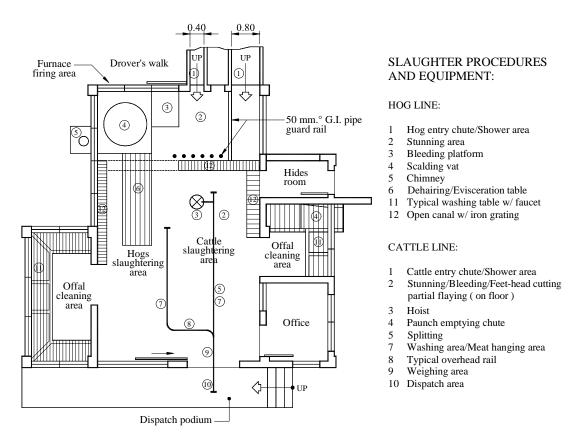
Typical floor plan and procedures for a class A slaughterhouse
